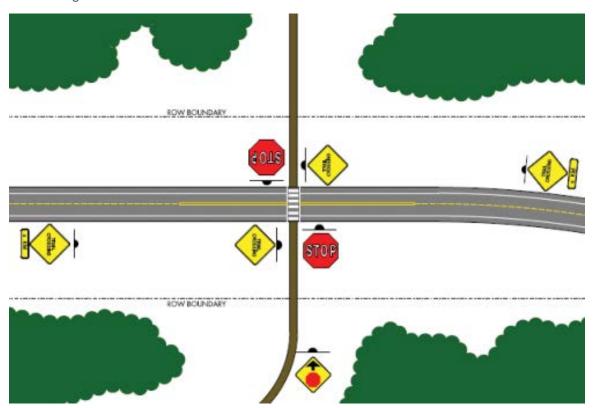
Example Signage Plan for a Mid-block Trail Crossing Two-Lane Undivided Roadway (Alberta Transportation)
